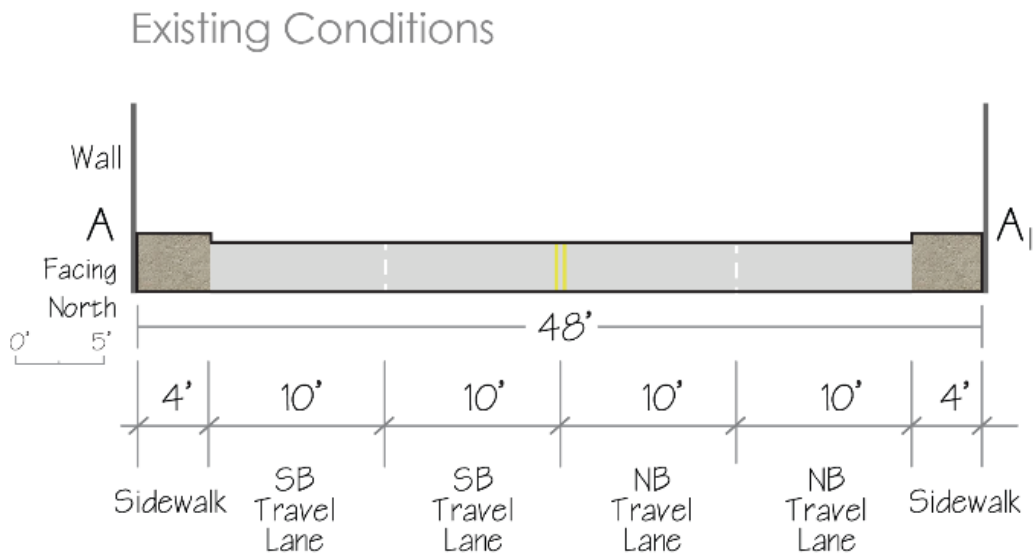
South Geddes Street/Erie Boulevard West Intersection Section Elevations, Concept 3
